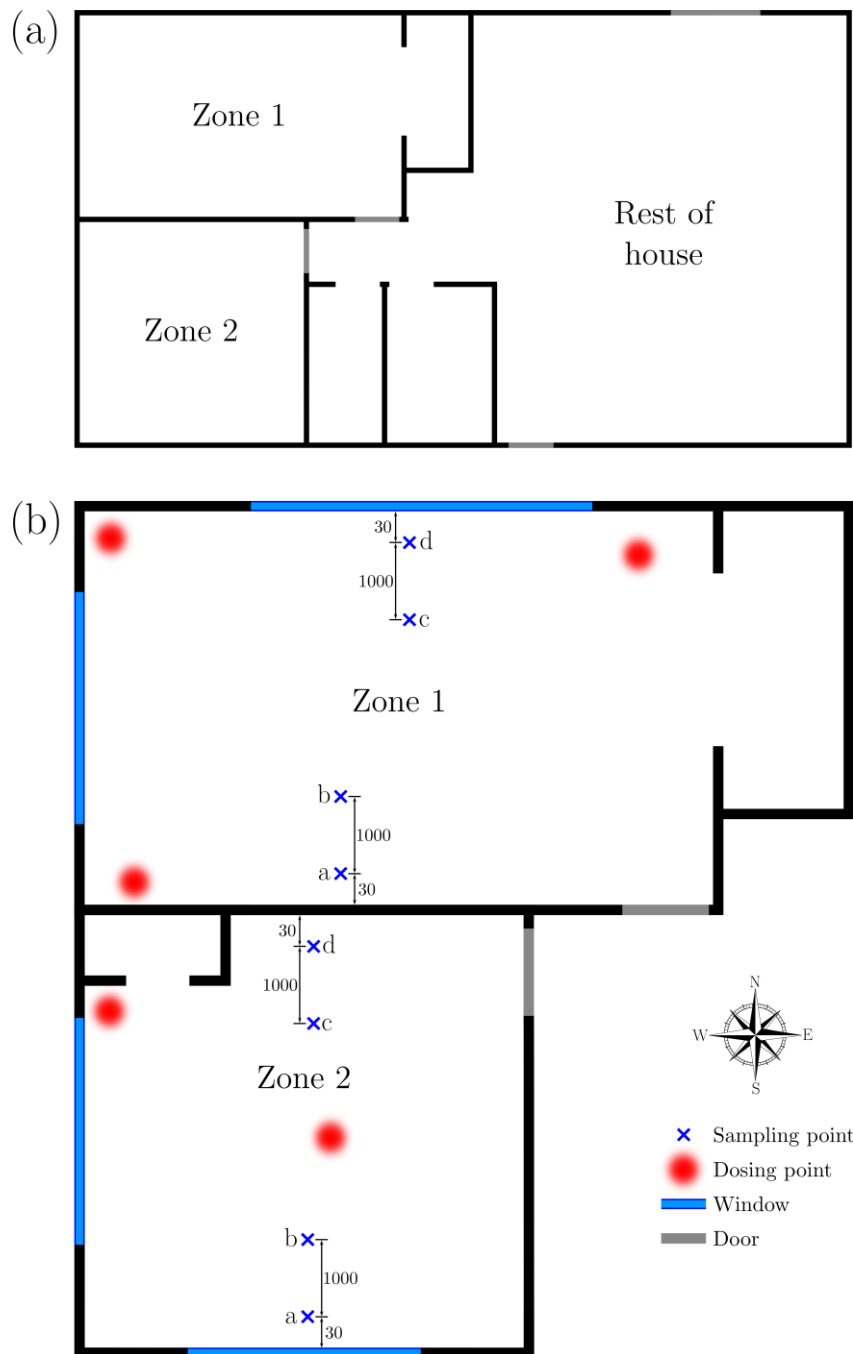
(a) Floor plan of the entire test house; (b) Locations of the sampling and dosing points in Zones 1 and 2 for horizontal mixing experiment. All sampling points were at a height of 1600 mm from the floor. Distances indicated in the figure are in units of mm.
